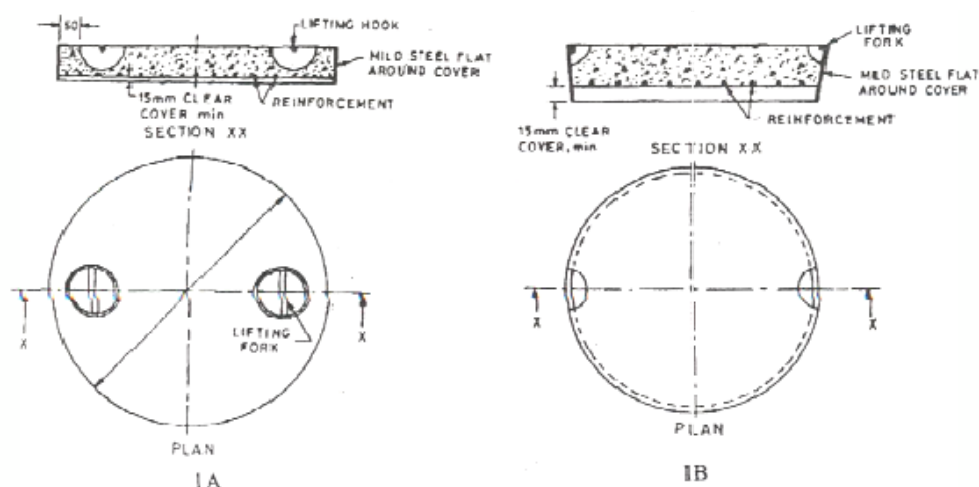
Typical Illustration of Circular Precast Concrete Manhole Cover
